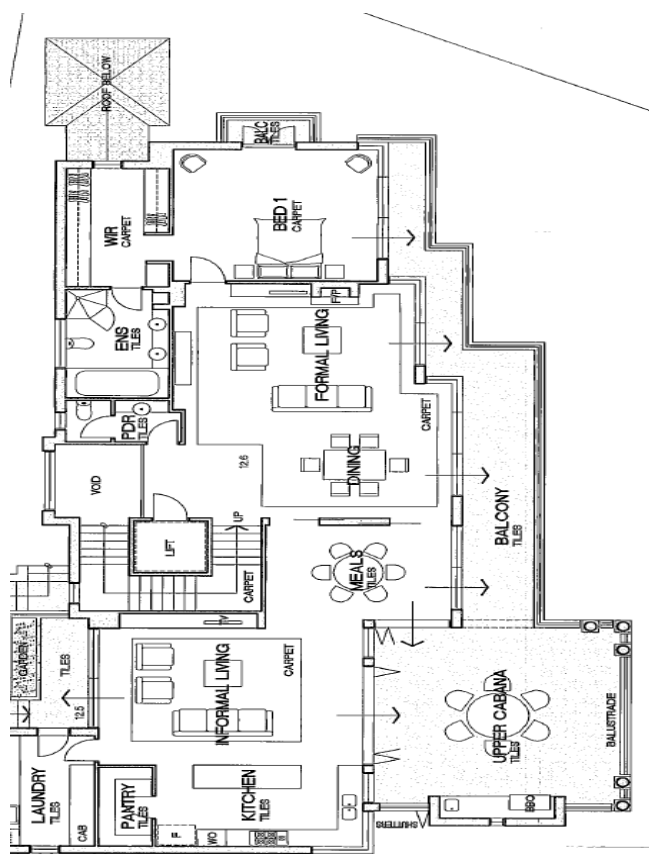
Approved Upper Floor Plan from DA-2006-301 issued for 1 Fraser Road. North is to top of image, east is to the right of image.
